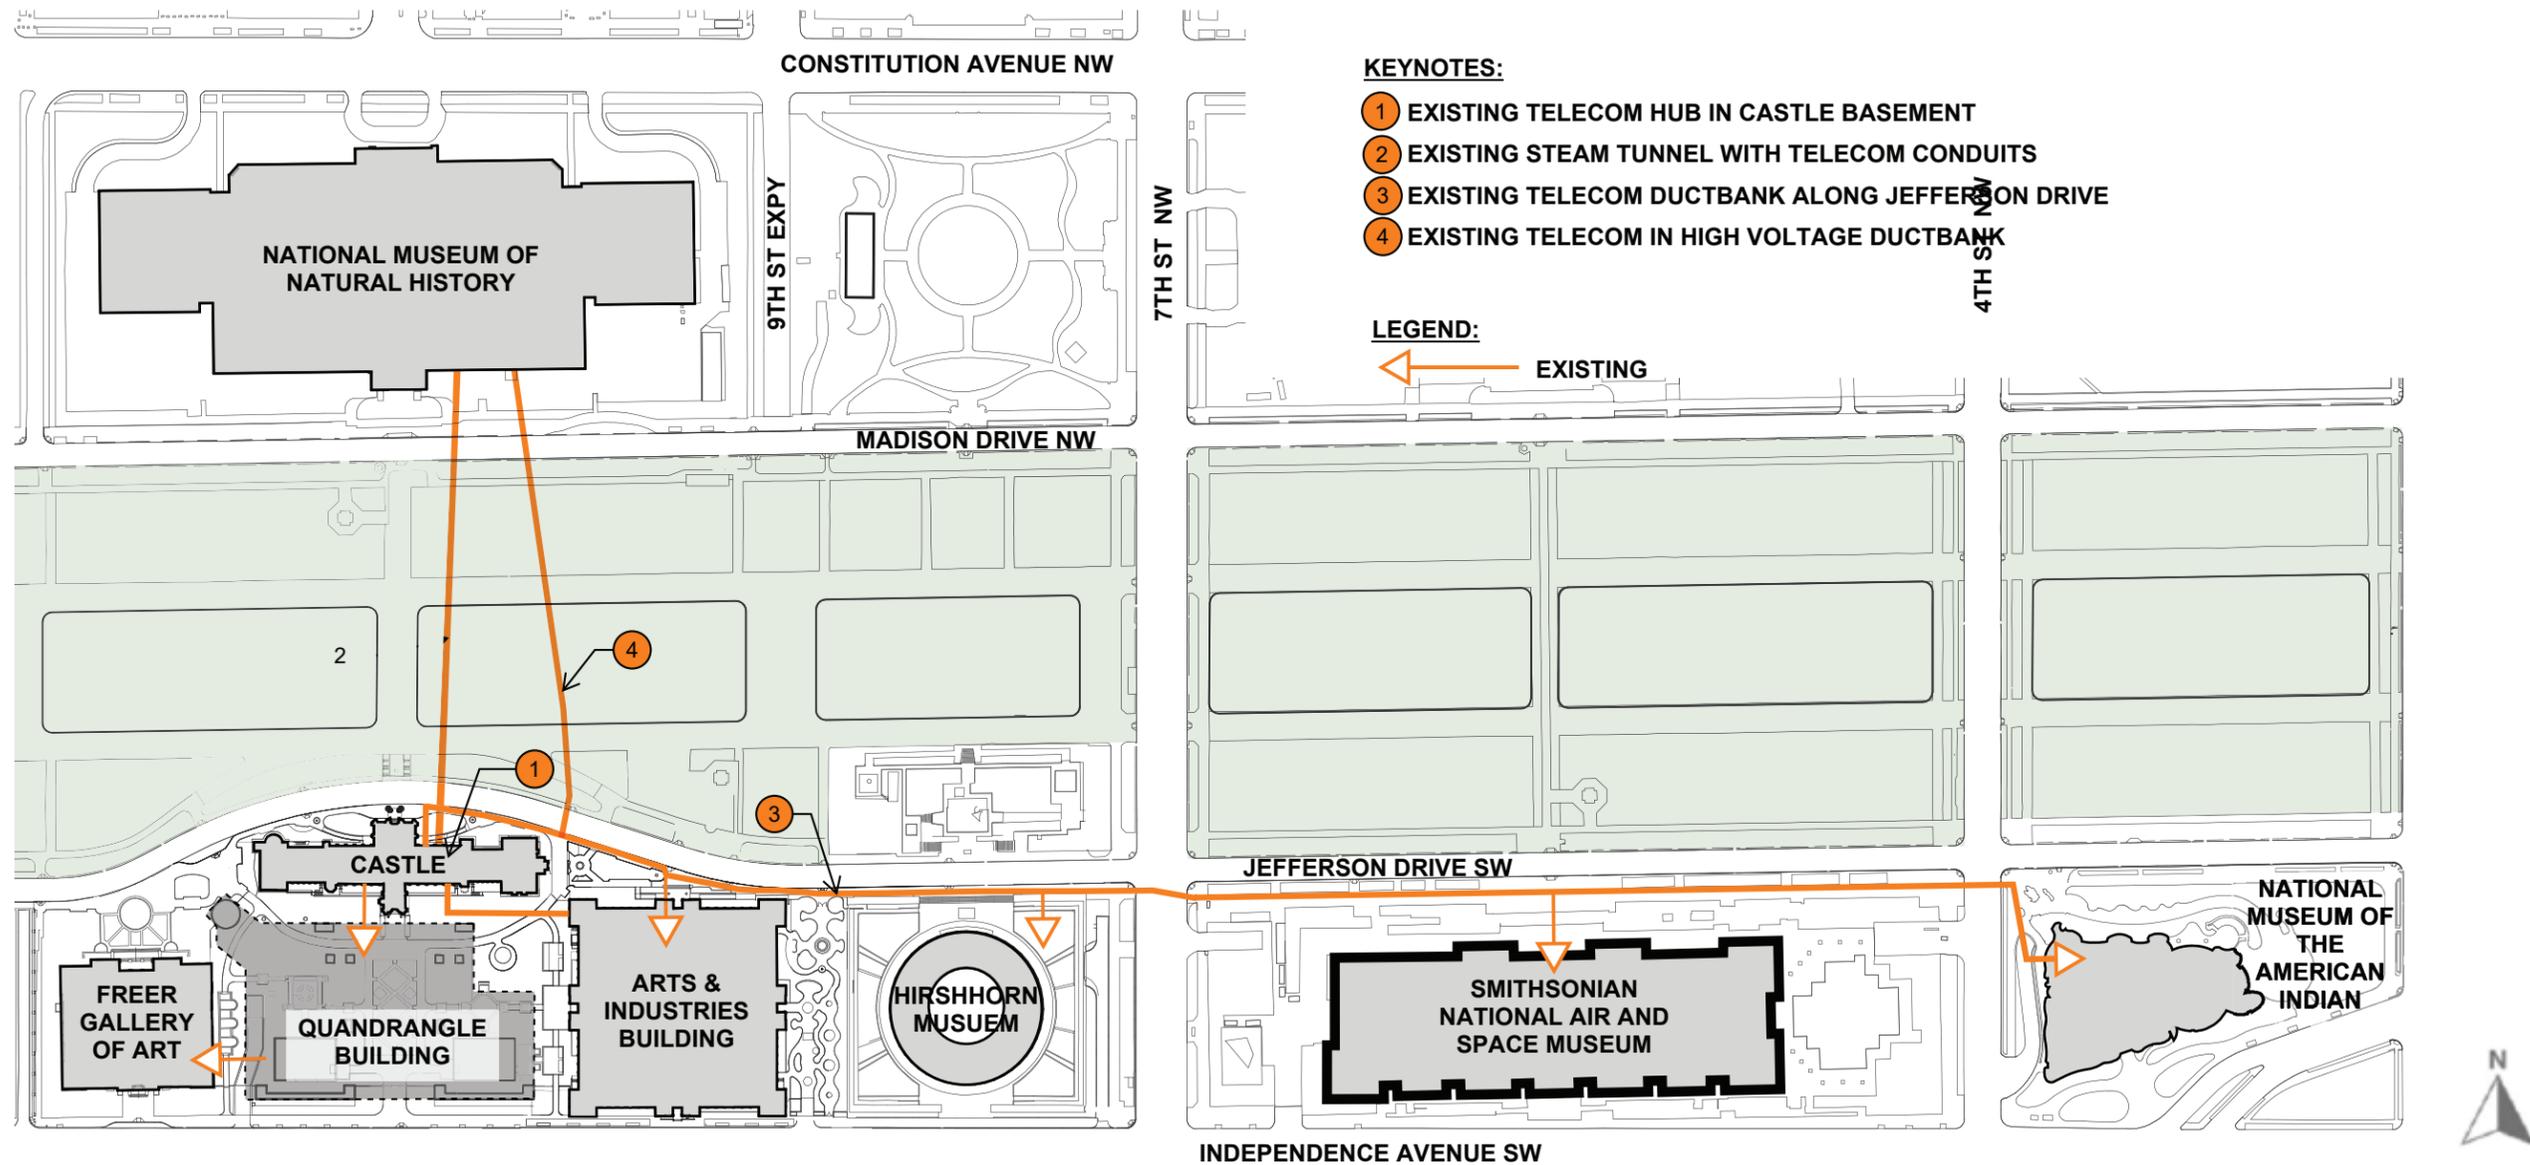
a - Site plan. Existing conditions diagram.
